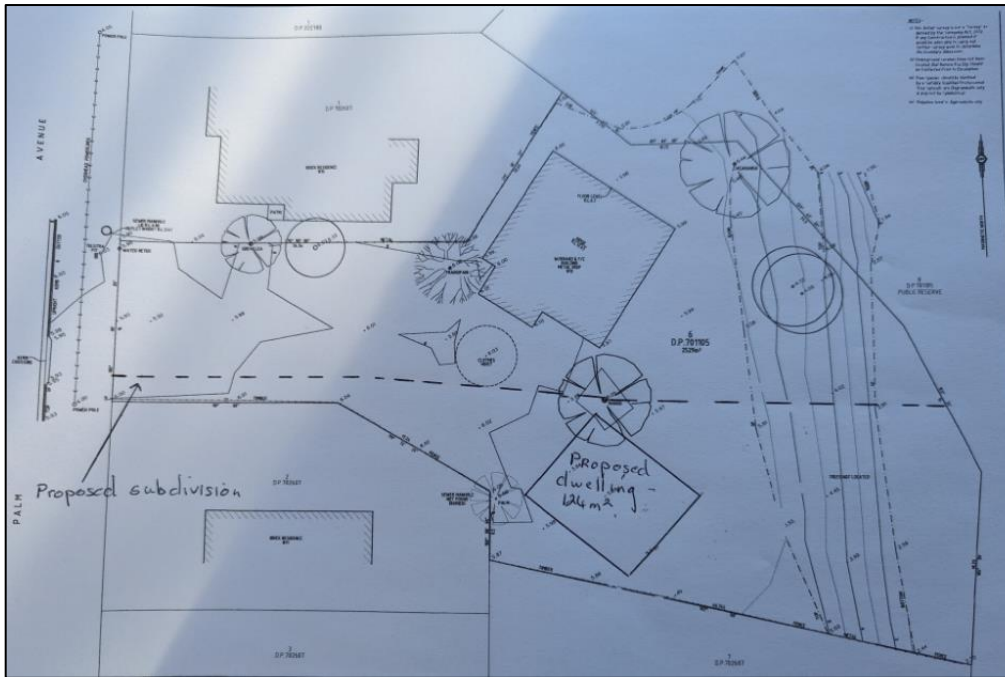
indicative plan of subdivision (proposed dwelling not included in this report).
